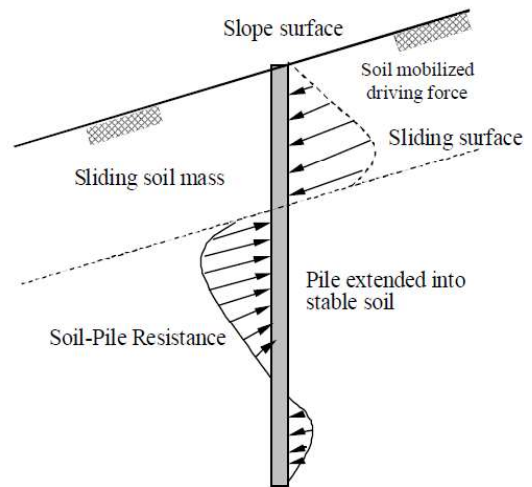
Horizontal force resulting from the sliding soil mass above the sliding surface (after Hamed Ardalan and Mohamed Ashour,2013)
